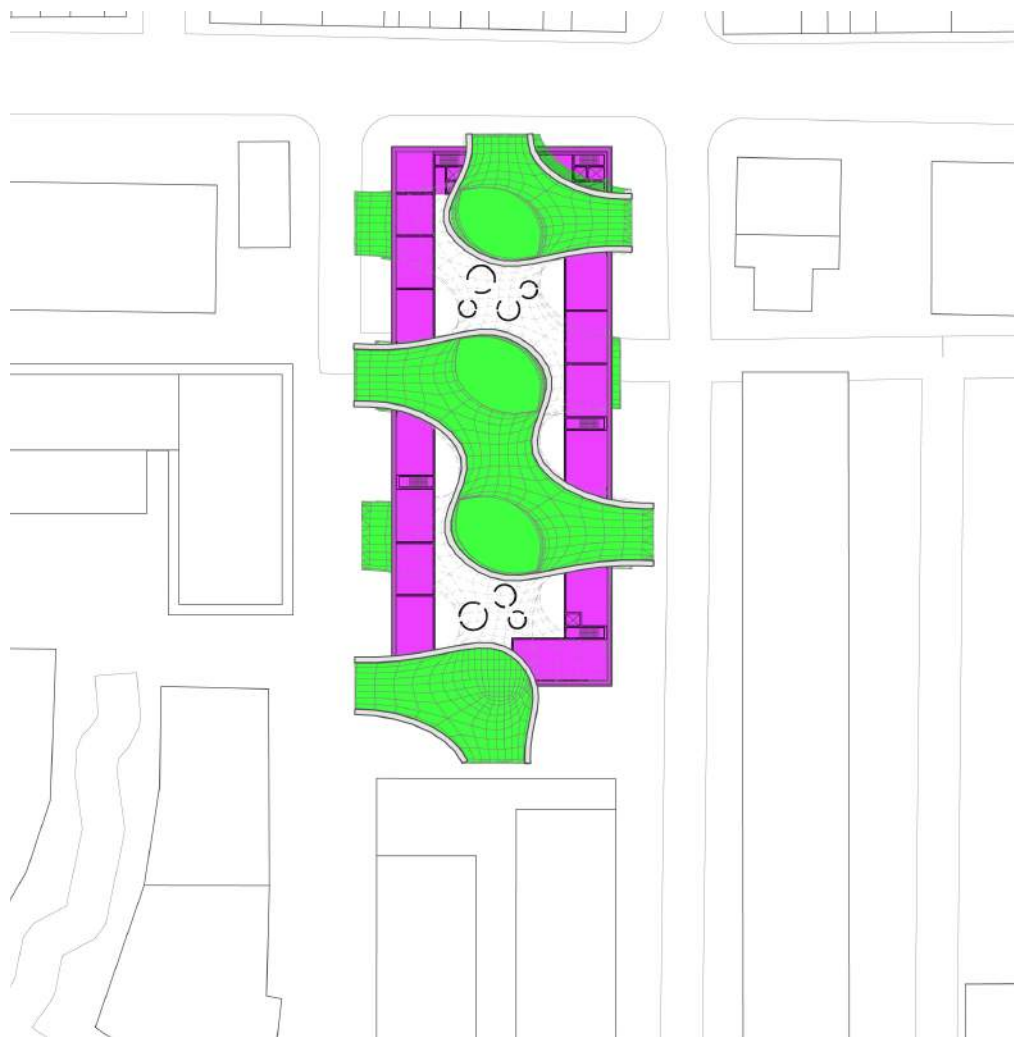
Typical plan of *Eco Tunnels* showing residential units in pink, and the green space in green. The remaining white is communal circulation and meeting space.
